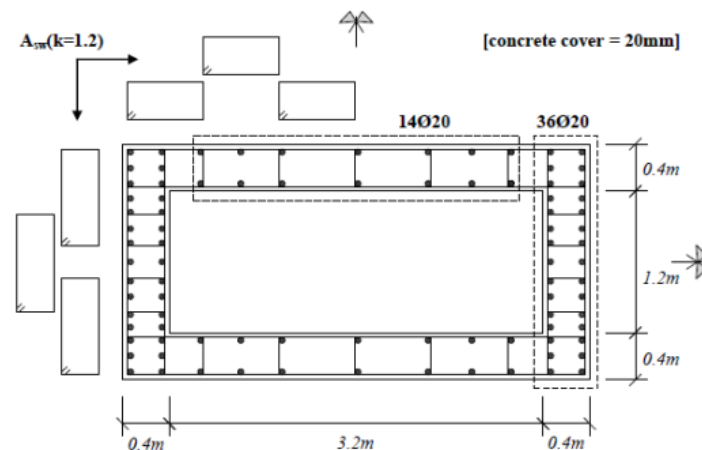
Illustration of structural detailing of the pier cross section [15]. The shorter side of the section is placed in the direction of the bridge deck
